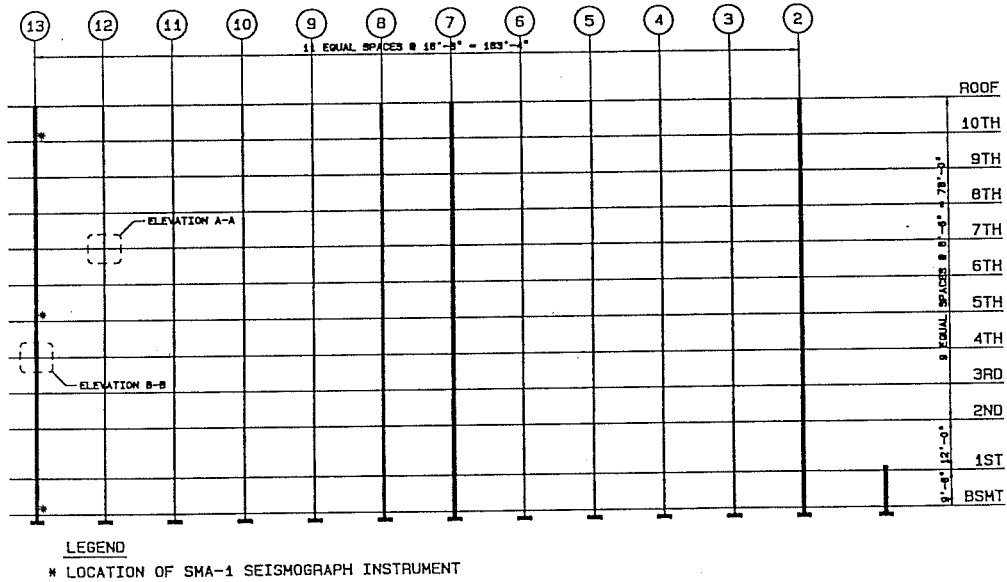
Elevation of Building on Grid C in Longitudinal Direction⁴⁸
